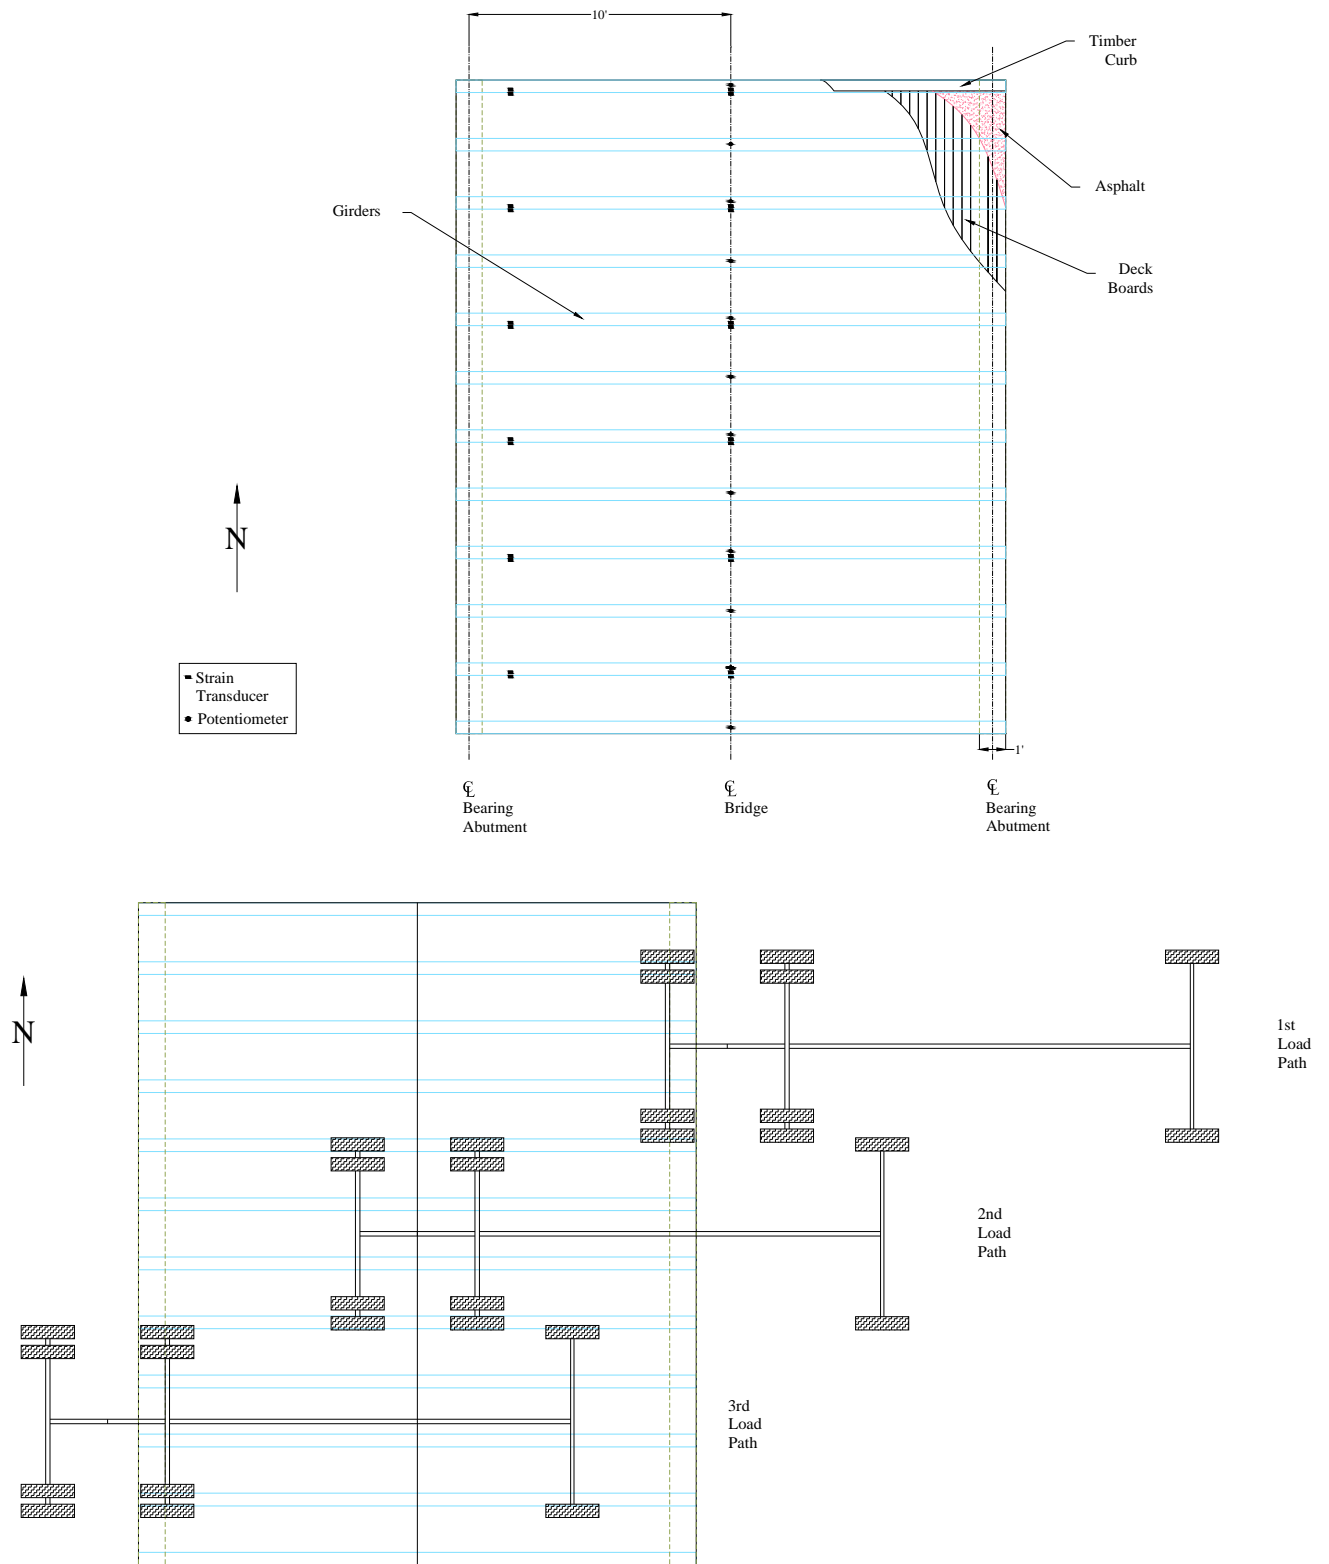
Instrumentation and Load Paths of Colorado Bridge
